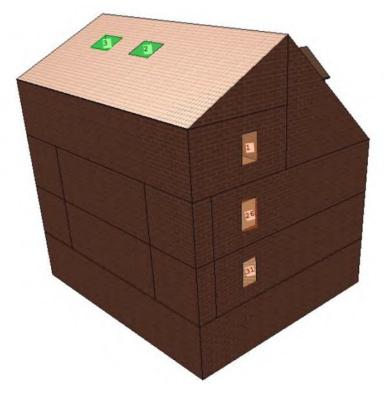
Window Maps of 31A Daleham Gardens (North Elevation)
